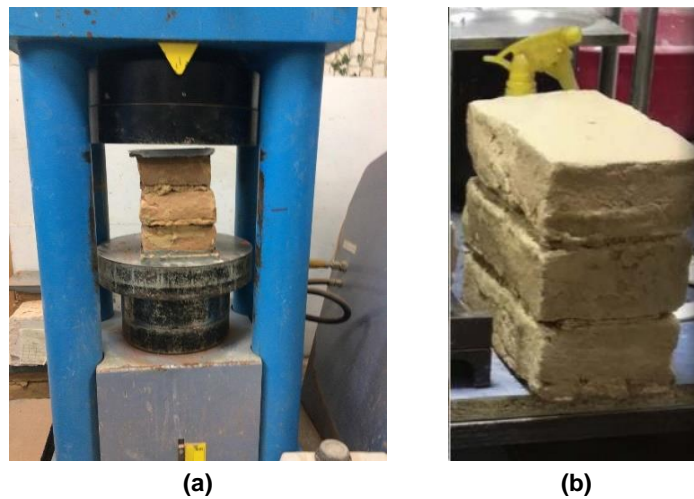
Compression test on masonry specimen (Dutu 2017).
